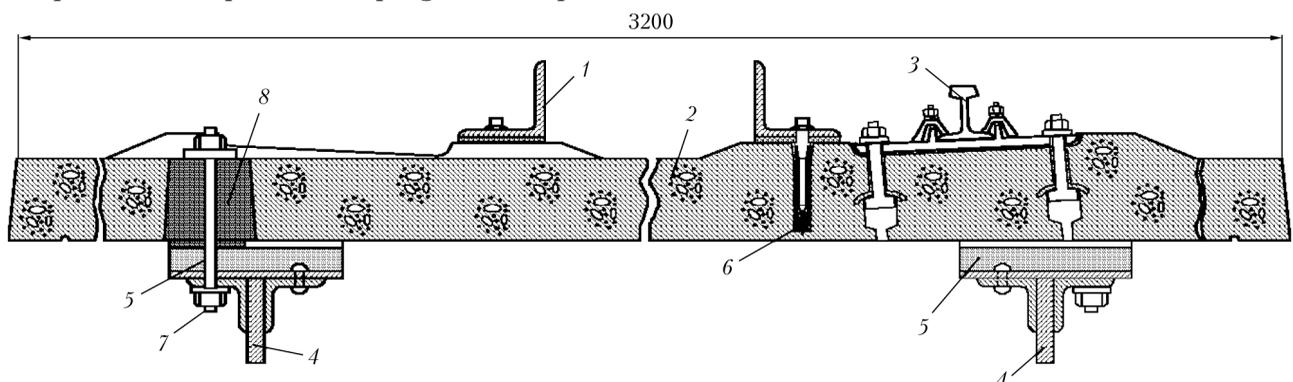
Structure of bridge deck based on BFBD slabs: 1 – contrangle; 2 – reinforced concrete slab of bridge deck; 3 – rail; 4 – main or longitudinal beam; 5 – spacing layer; 6 – polymer dowel with screw spike; 7 – high-strength stud; 8 – hole for stud
